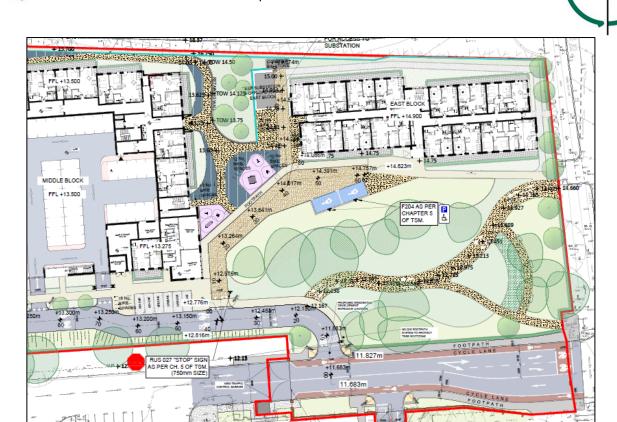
Proposed Access Arrangements and Provision for Future Integration with Planned Active Travel Scheme
